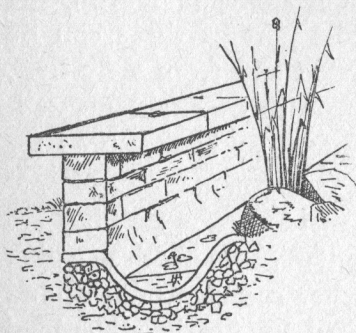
METHOD OF CONSTRUCTING A BOUNDARY WALL FOR A REPTILIARY.
